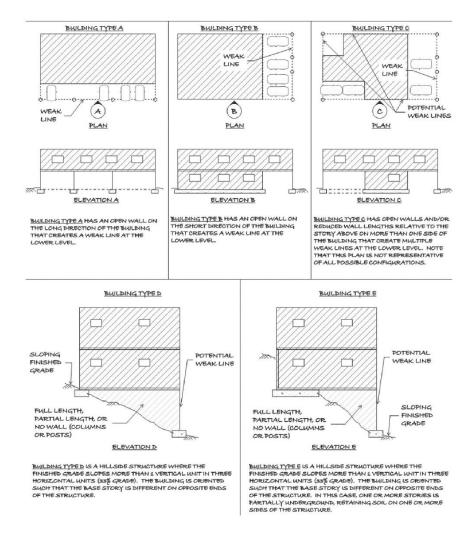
SWOF building types as assigned by the City of West Hollywood screening form (image credit: CWH, 2019).
